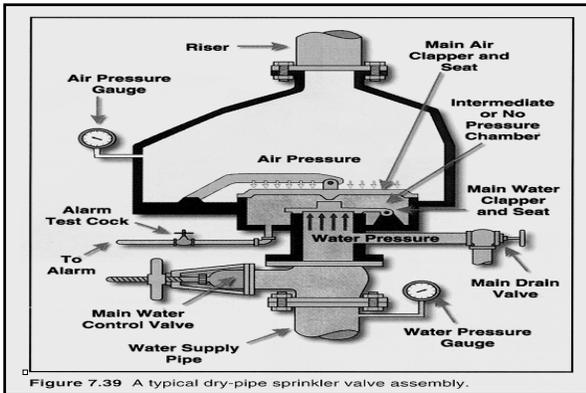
A typical dry-pipe sprinkler valve assembly.
